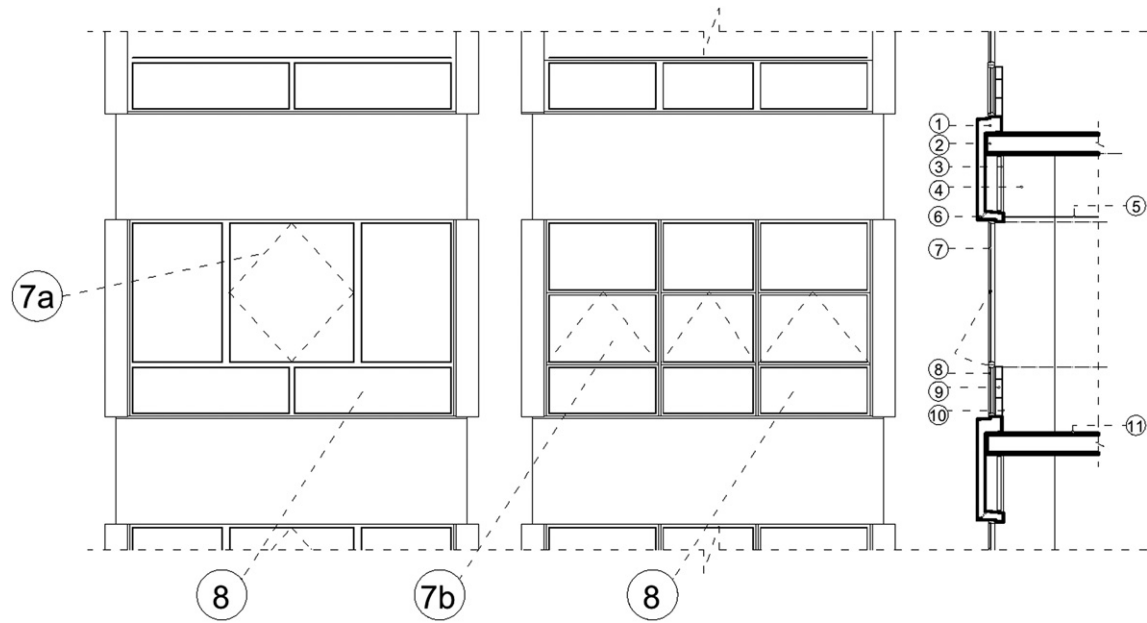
Detail of one bay of original 1969 elevation (glazed area 57%) and subsequent re-glazing with thermal break aluminium frame. Key: 1 Precast aggregate concrete panels; 2 Floor slab (10 inches, 250 mm) with 3 inches (70 mm) cement sand screed; 3 Fibre board lining on timber battens; 4 Ceiling void (approx. 2 feet 11 inches, 900 mm deep); 5 Radiant ceiling: perforated metal trays with attached low pressure hot water heating pipes; 6 Drainage channel to divert away any infiltration by driving rain; 7a Original single-glazed centre pivot teak frame window; 7b Replacement 2004 aluminium frame thermal break double glazed units; 8 Fixed panel of opaque glass; 9 Blockwork behind fixed glazed panel; 10 Internal lining, assumed plasterboard on slabs; 11 Floor covering, linoleum in original, various vinyls subsequently.
